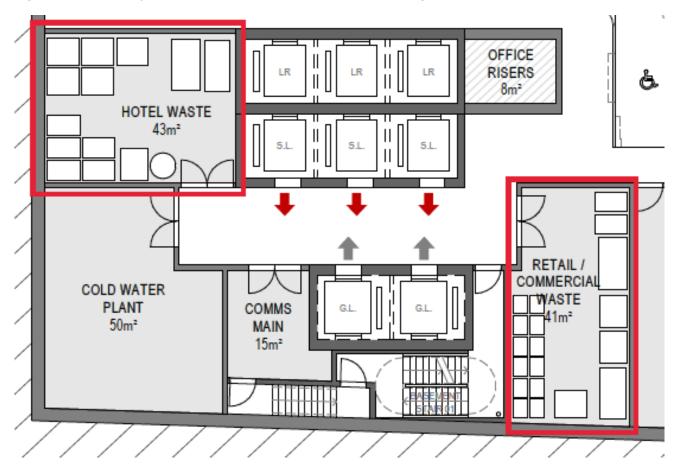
Indicative layout of retail/commercial and hotel waste storage areas on B3
